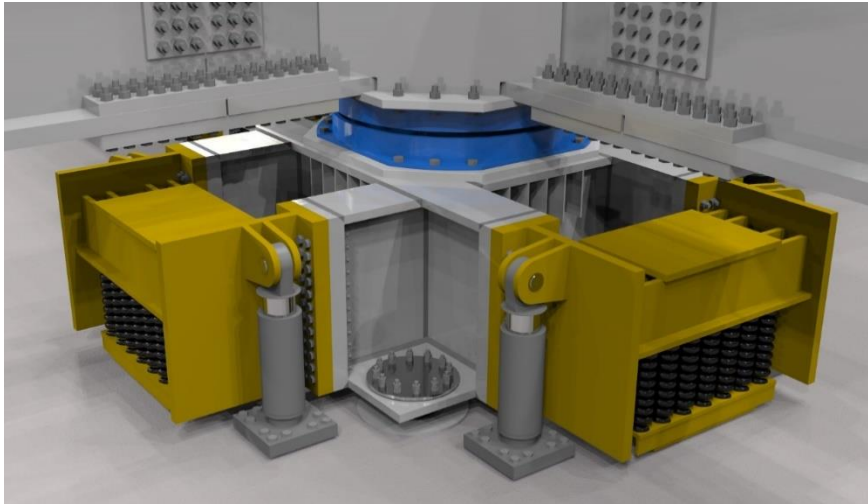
Rendering of VIS with helical spring boxes, dampers, and sliding shear pins mounted to concrete-filled steel pedestal and sitting below Triple Friction Pendulum (TFP) bearings
